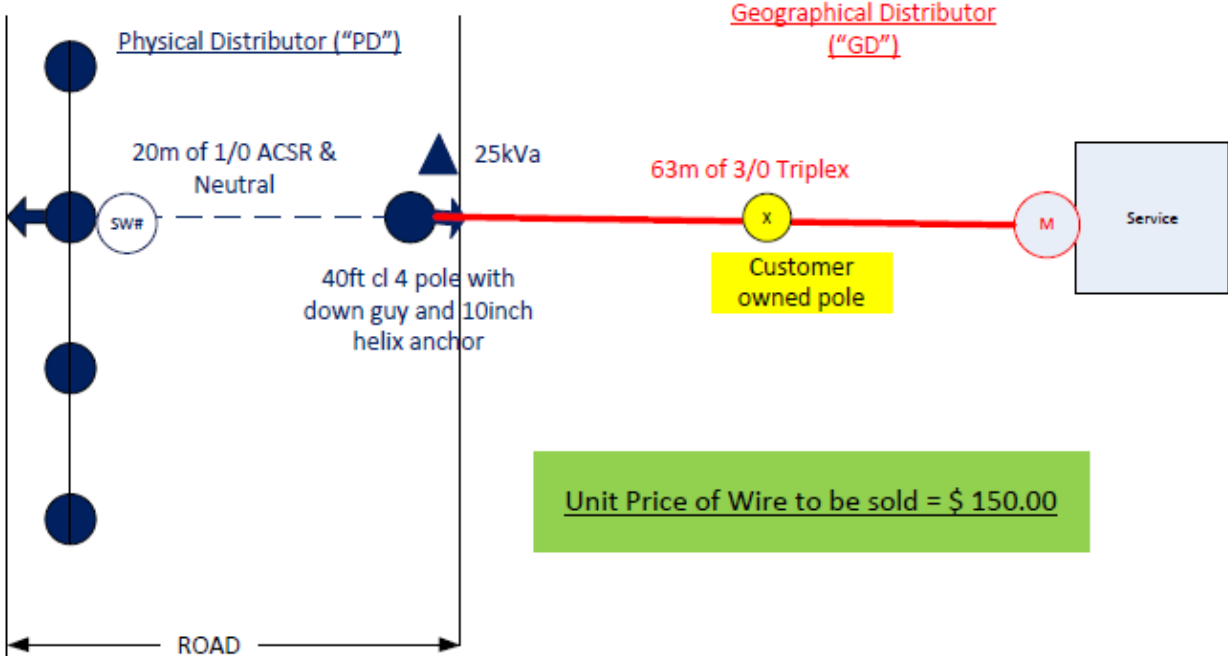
Private Primary Overhead “GD” supplied transformer, switch and Road crossing
